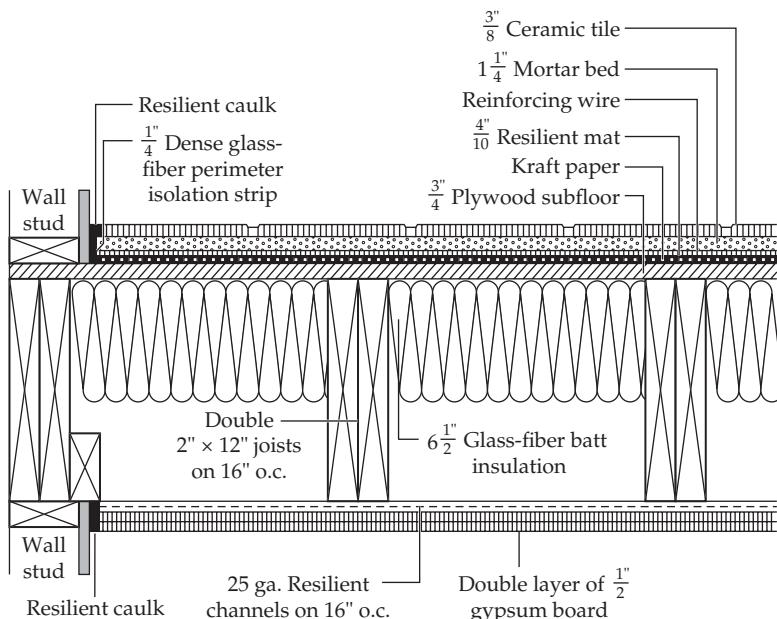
Example of floor/ceiling construction. (Blazier.)
